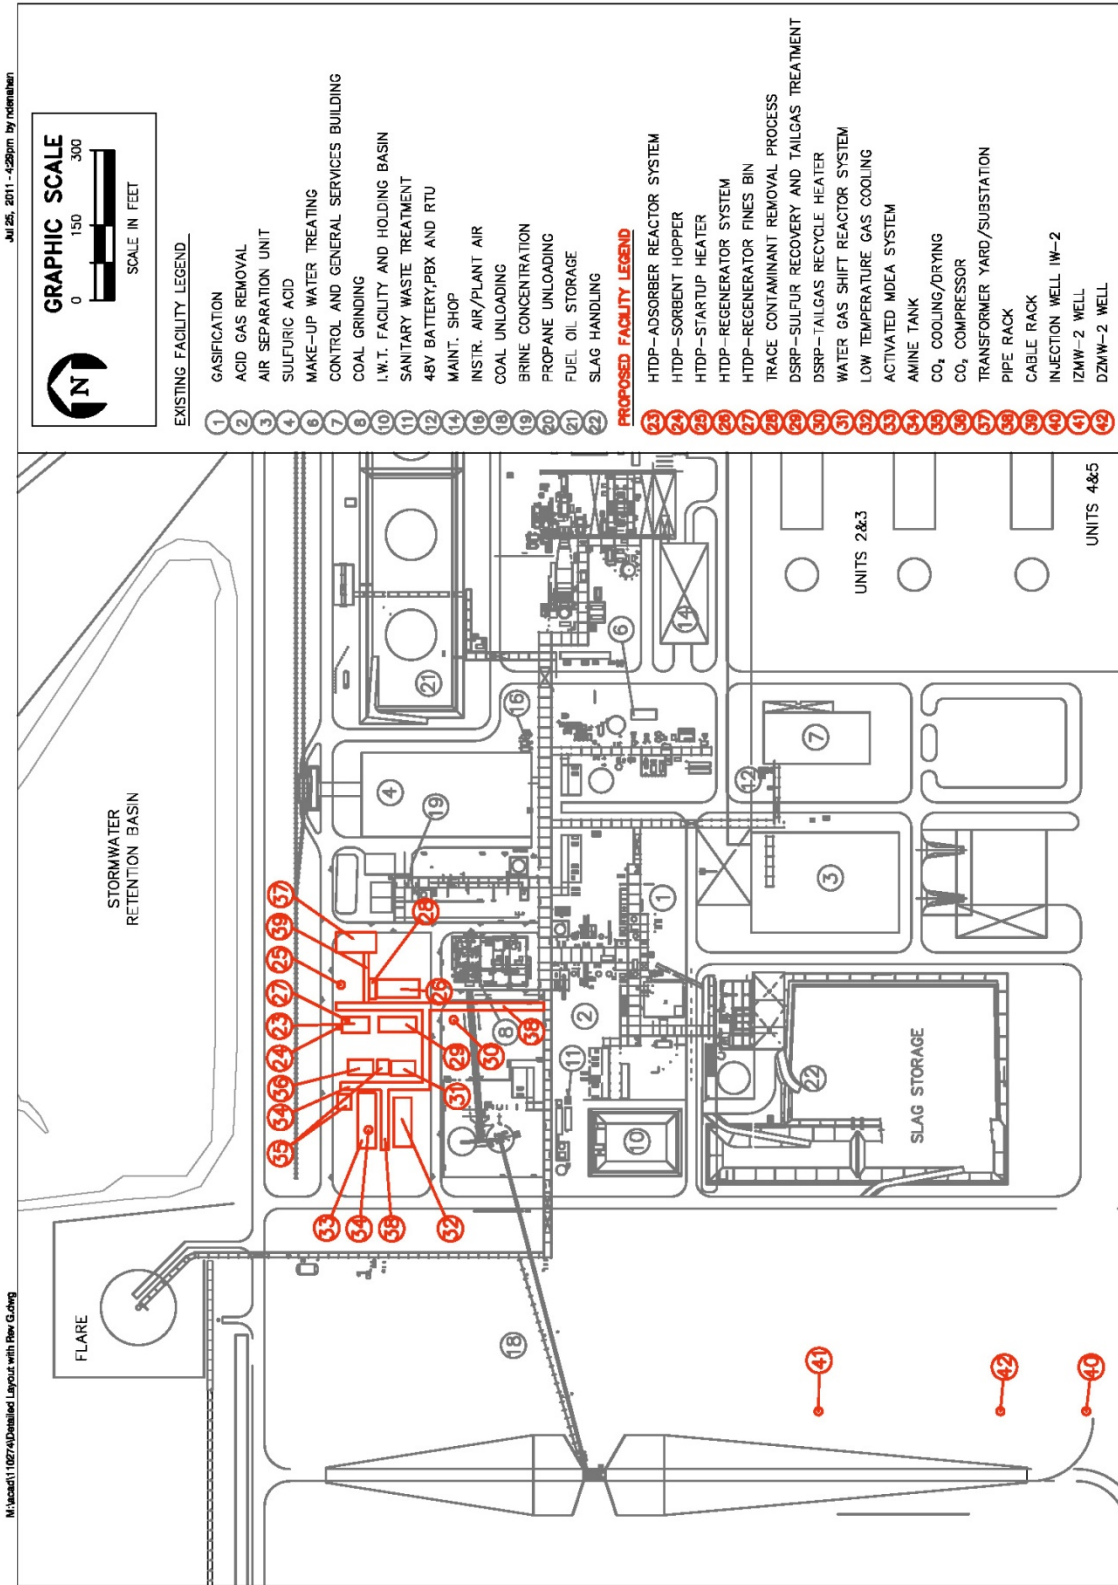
General Arrangement of RTI's Proposed Project Facilities within Tampa Electric's Existing Facility Layout
